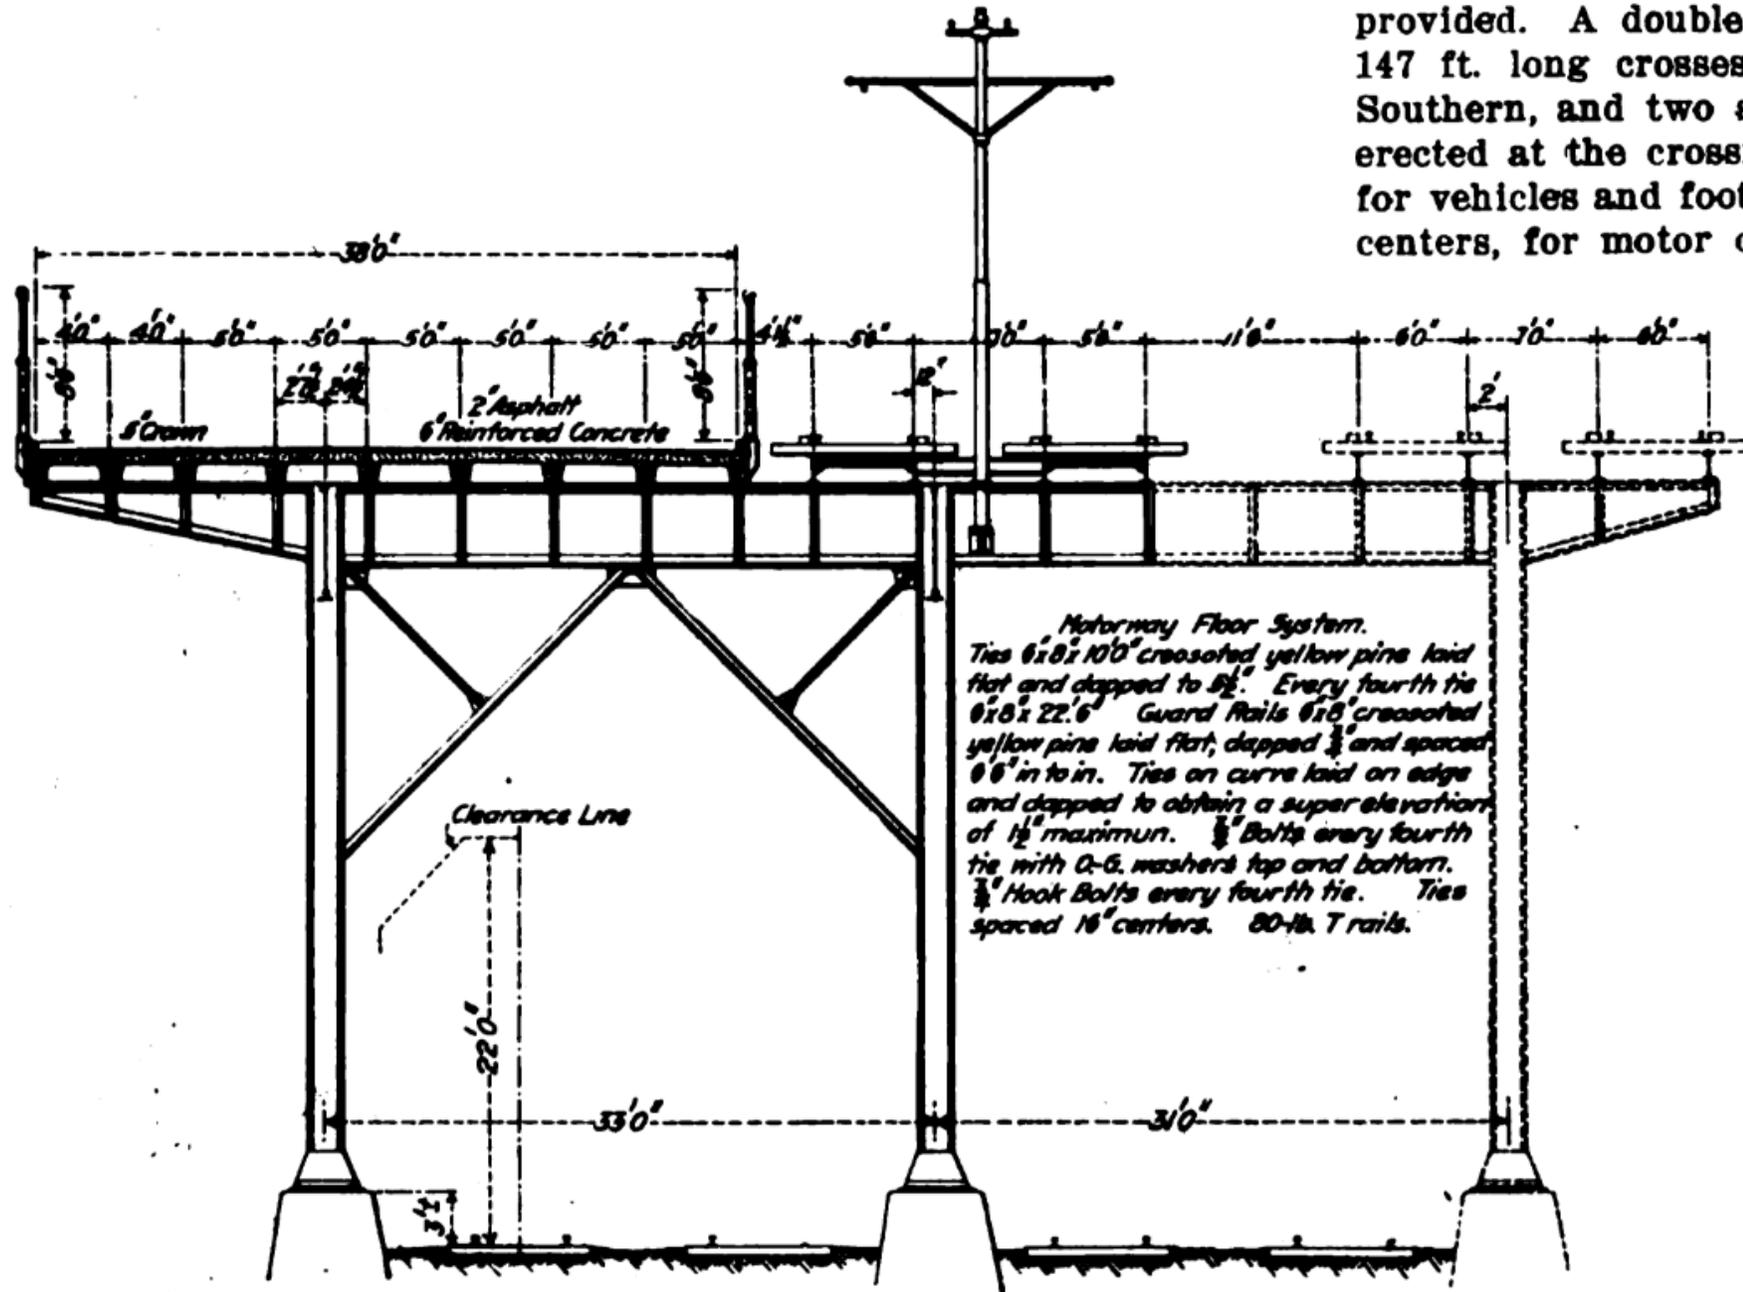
Elevation of Bridge Over the Kaw River for the Sixth Street Viaduct.
